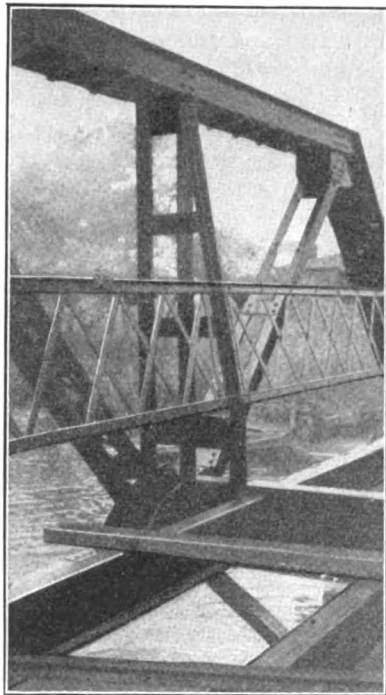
MICHIGAN STANDARD PONY-TRUSS BRIDGE
